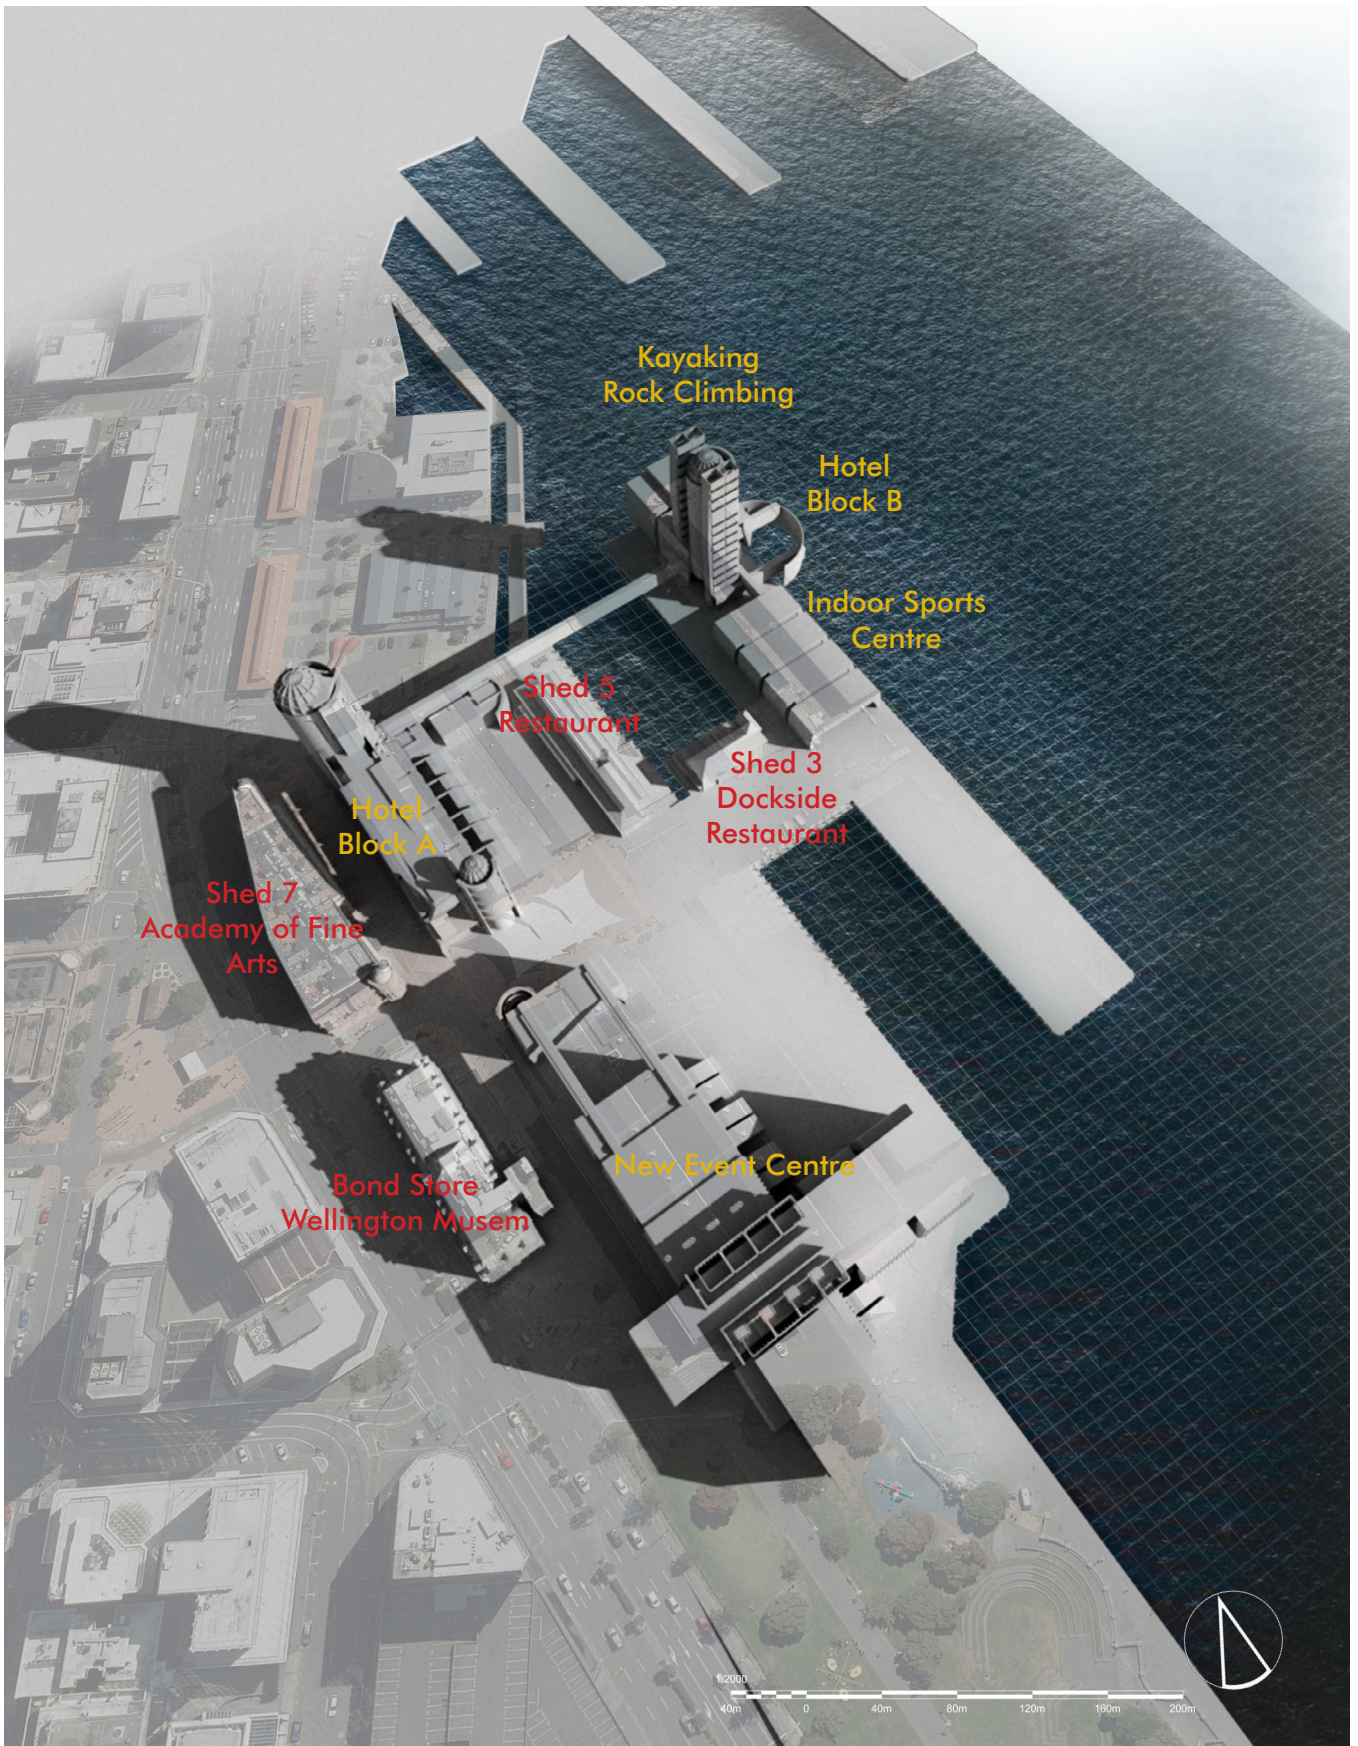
View of master plan of Developed Design. Red font represents existing building; orange font represents new architectural intervention.
